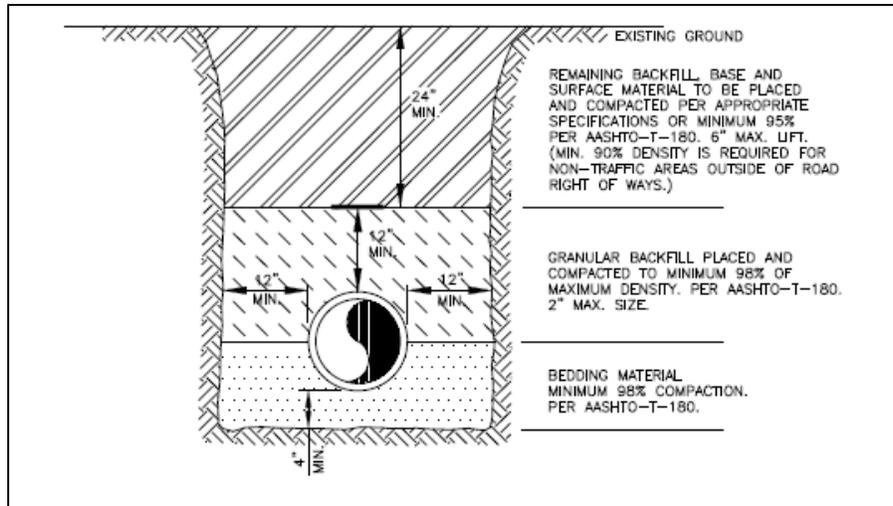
PBCWUD Typical Trench Restoration Standard Detail
